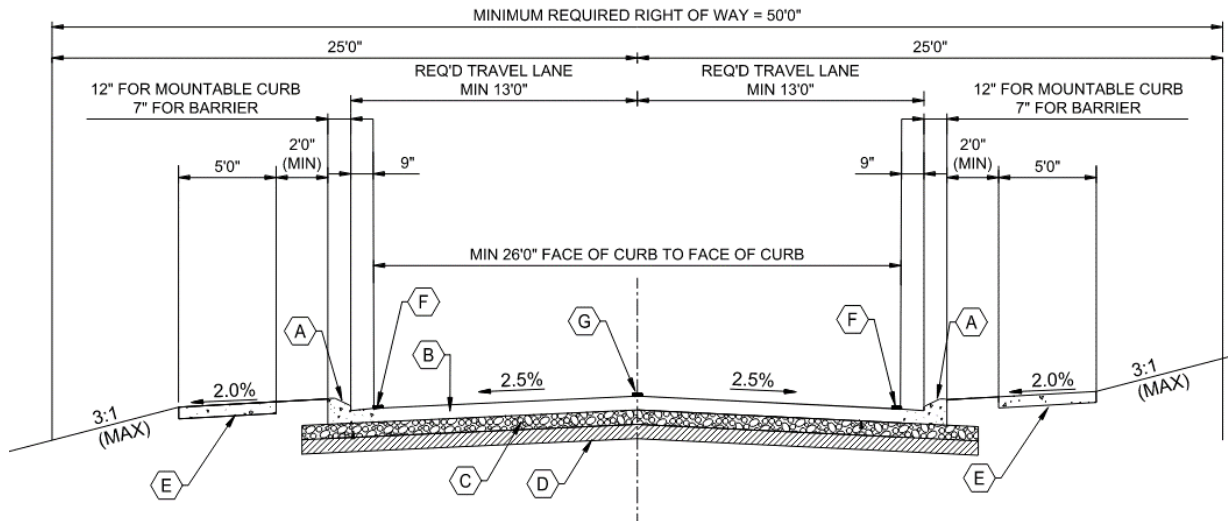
Cross Section Elements and Requirements for Curbed Roadway, 2-Lane, Asphalt Concrete Pavement
